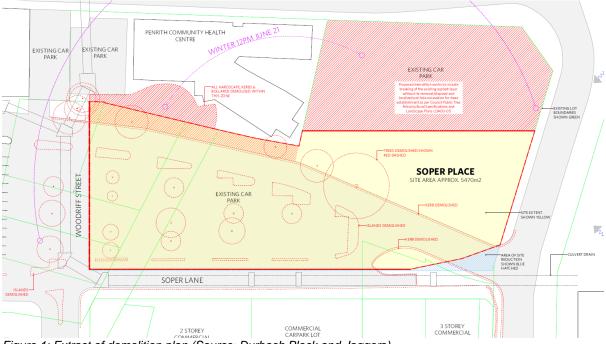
Extract of demolition plan (Source: Durbach Block and Jaggers)
